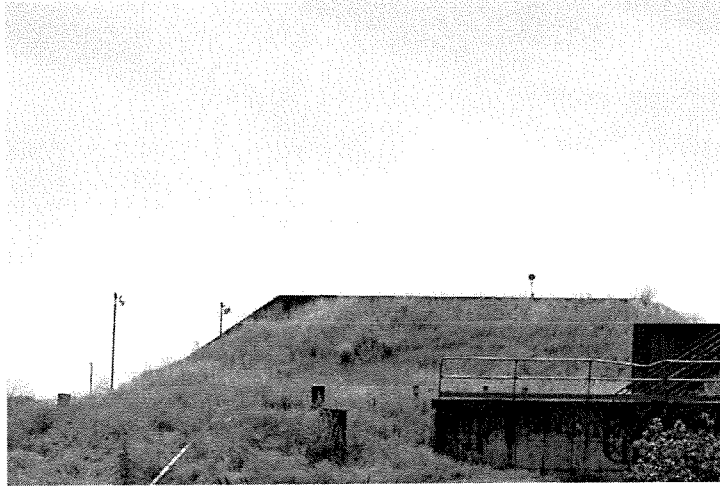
LOX Tank Area (Units 74 and 75), Test Stand No. 1, Alpha Test Complex, 1956-1957. Looking south/southwest. View of May 2005.
